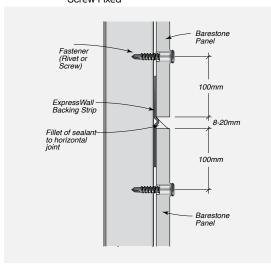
Horizontal Joint - Angled Backing Strip
